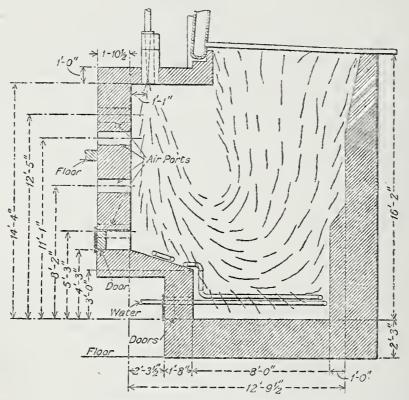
Cross-Section of Boiler Furnace used in Tests
